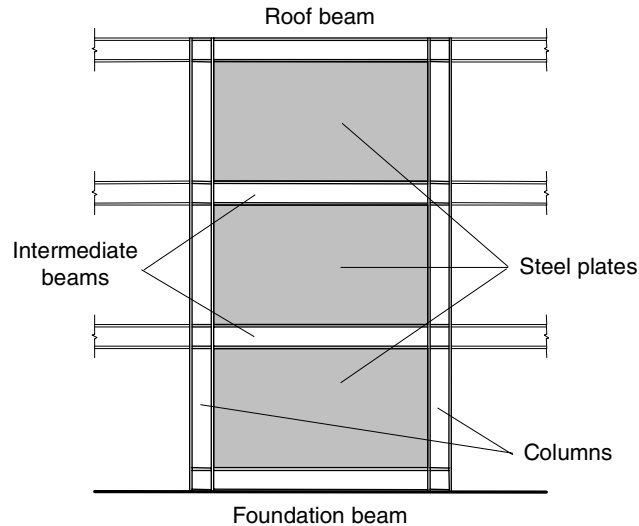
Schematics of a typical Steel Plate Shear Wall (SPSW)
